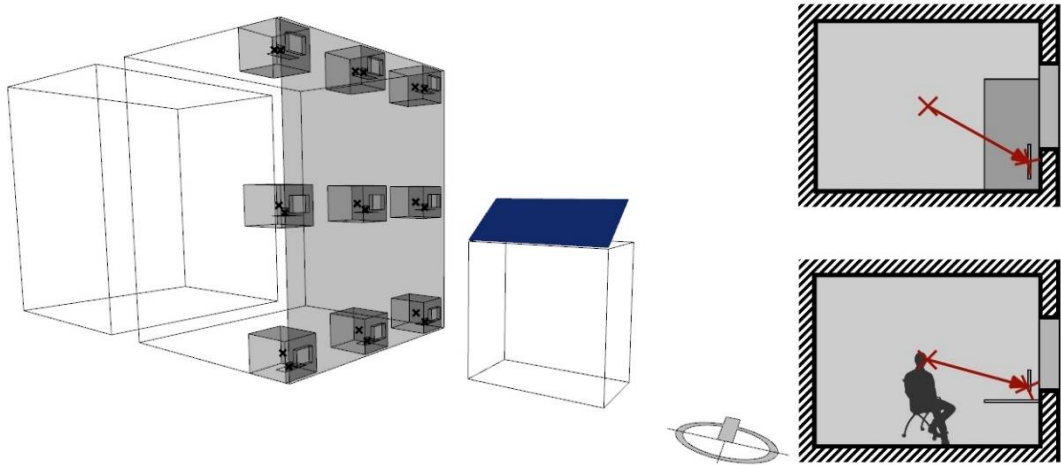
Building surface with standardized rooms towards the PV panel; floor plan of the standardized room (top right), section of the room (bottom right)
